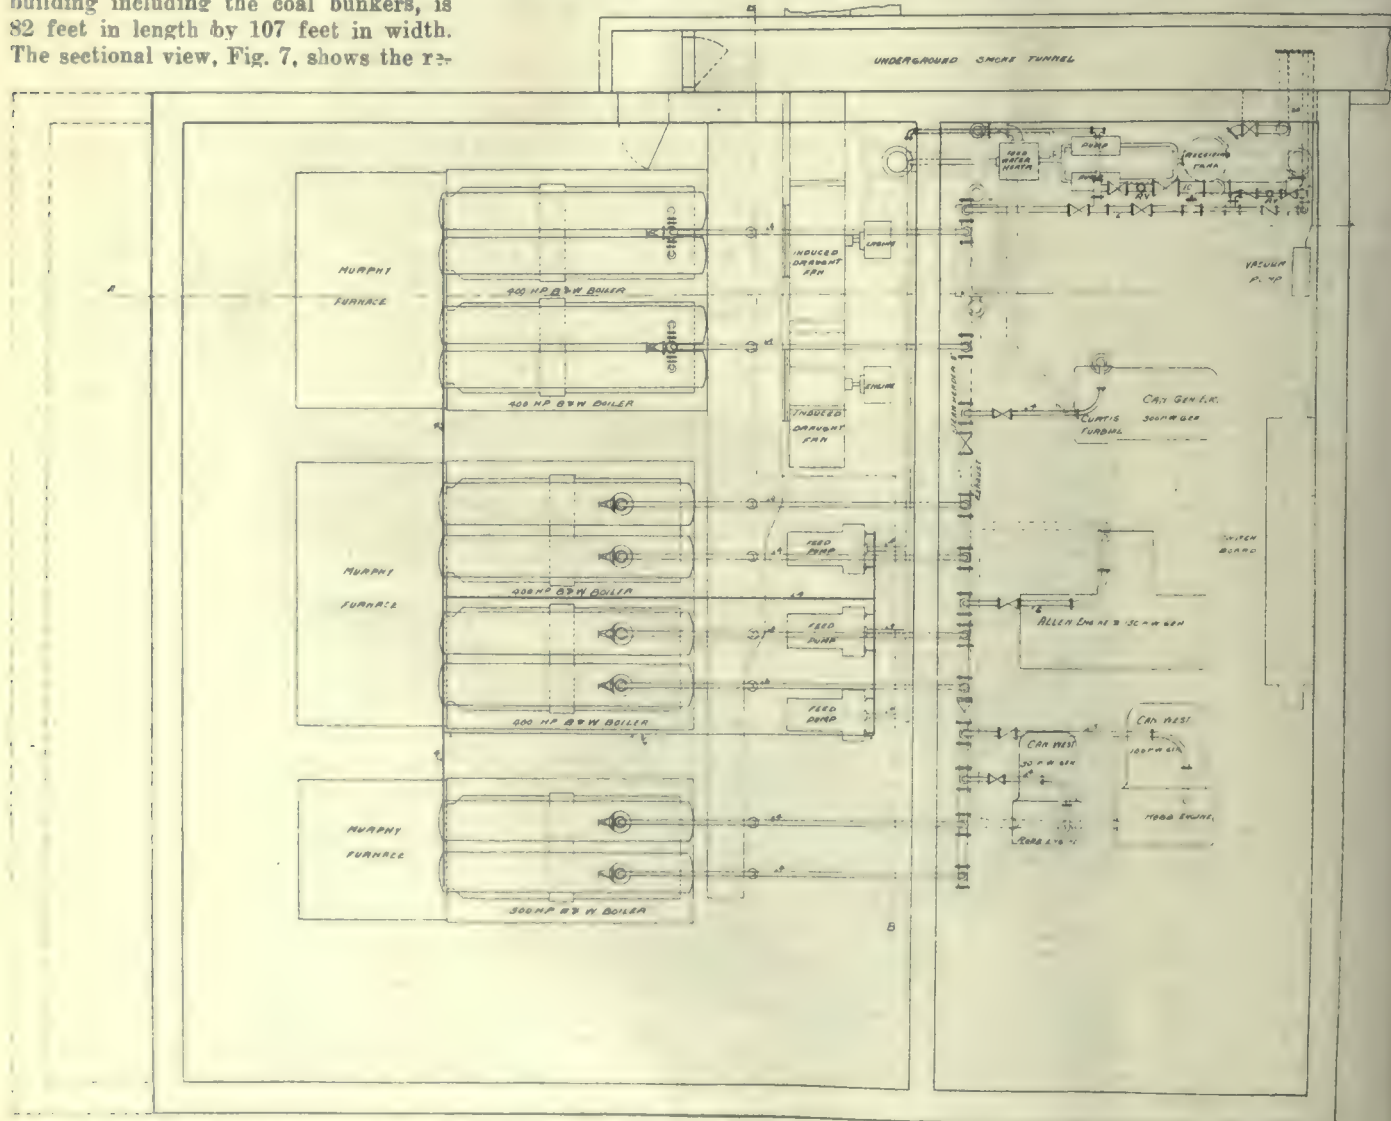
PLAN OF POWER HOUSE SHOWING LAYOUT OF BOILER AND ENGINE ROOMS, ALSO LOCATION OF UNDERGROUND SMOKE TUNNEL
